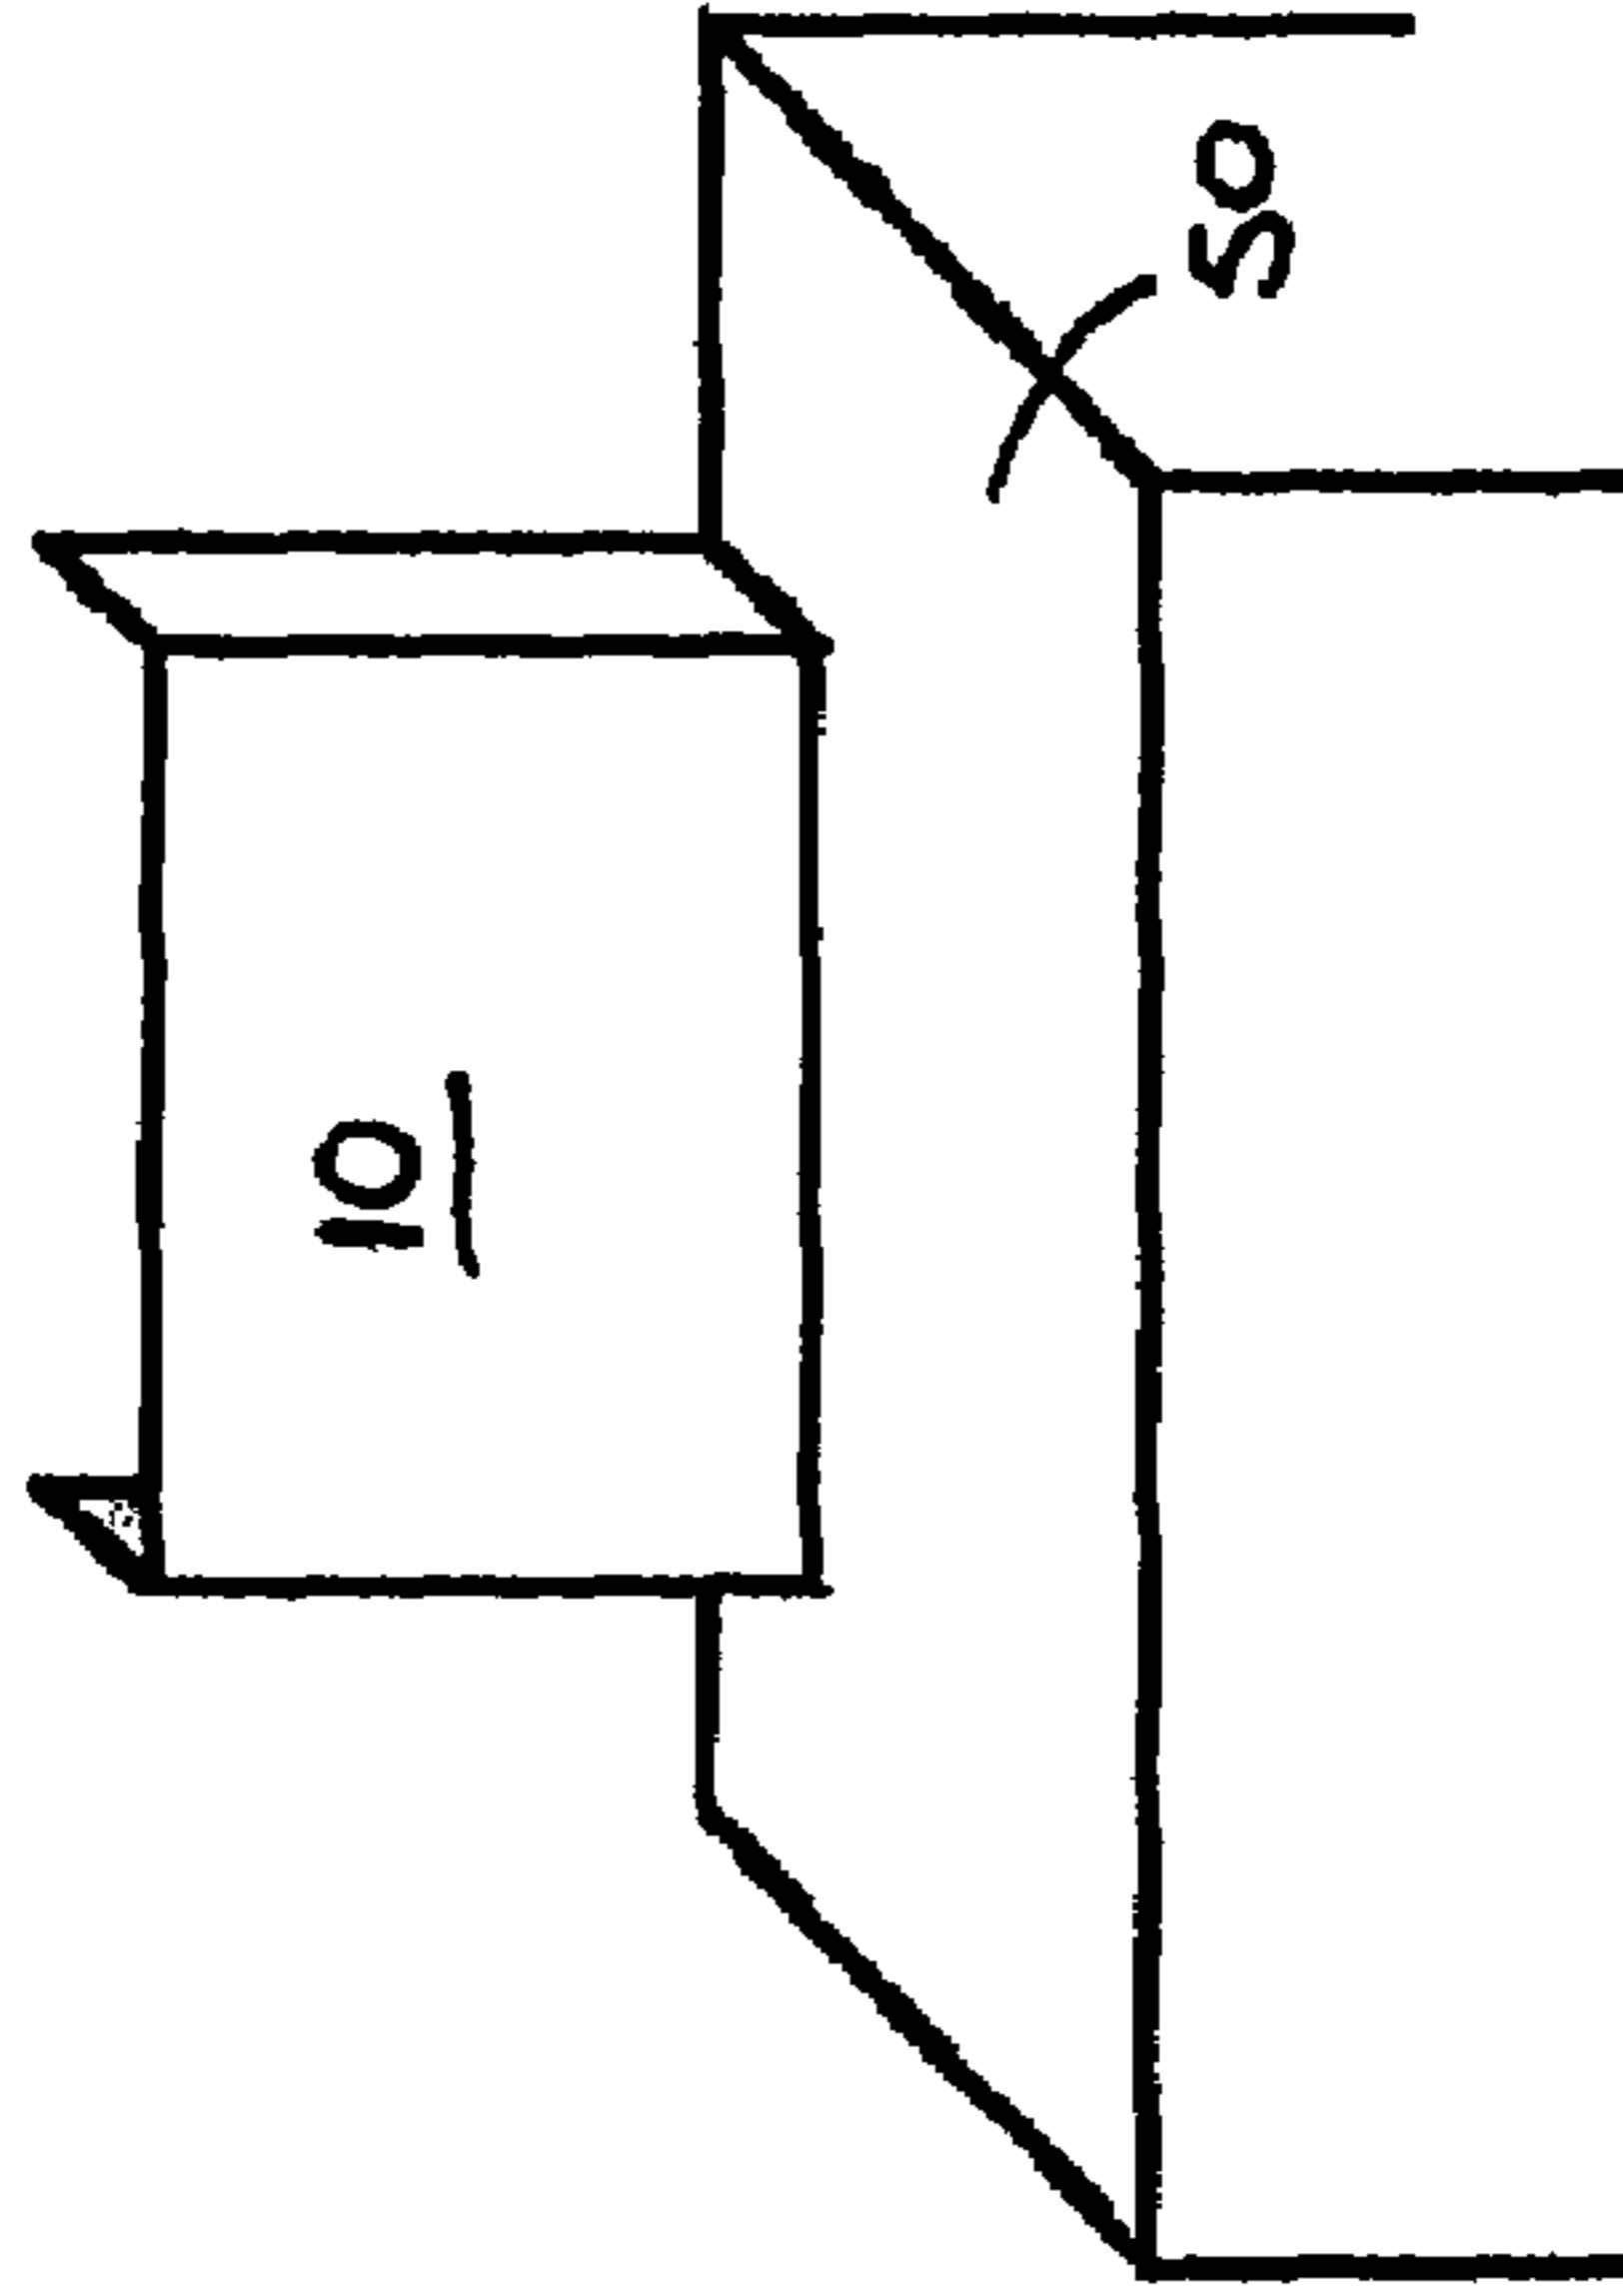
D. COMPLETED HEADER STANDS UPRIGHT.
